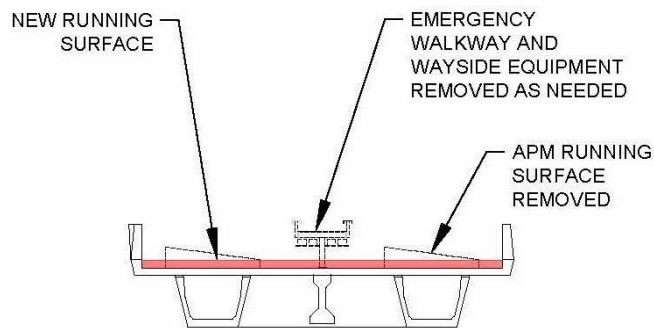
Potential Retrofit AV Guideway Cross-Section at Curves (Typical)
